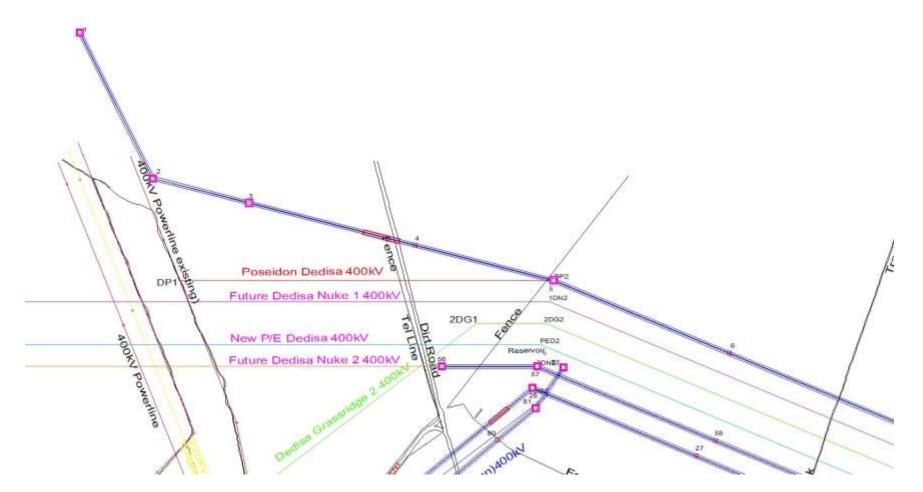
Development plan indicating the proposed construction sites and relevant access tracks that must be used.
